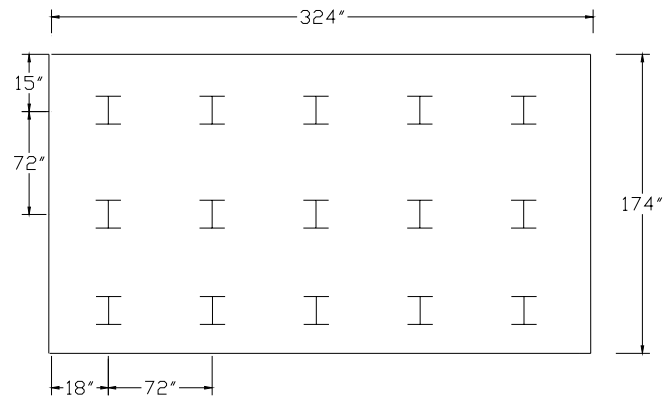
AASHTO Wall Design Details (Expansion Bent)
